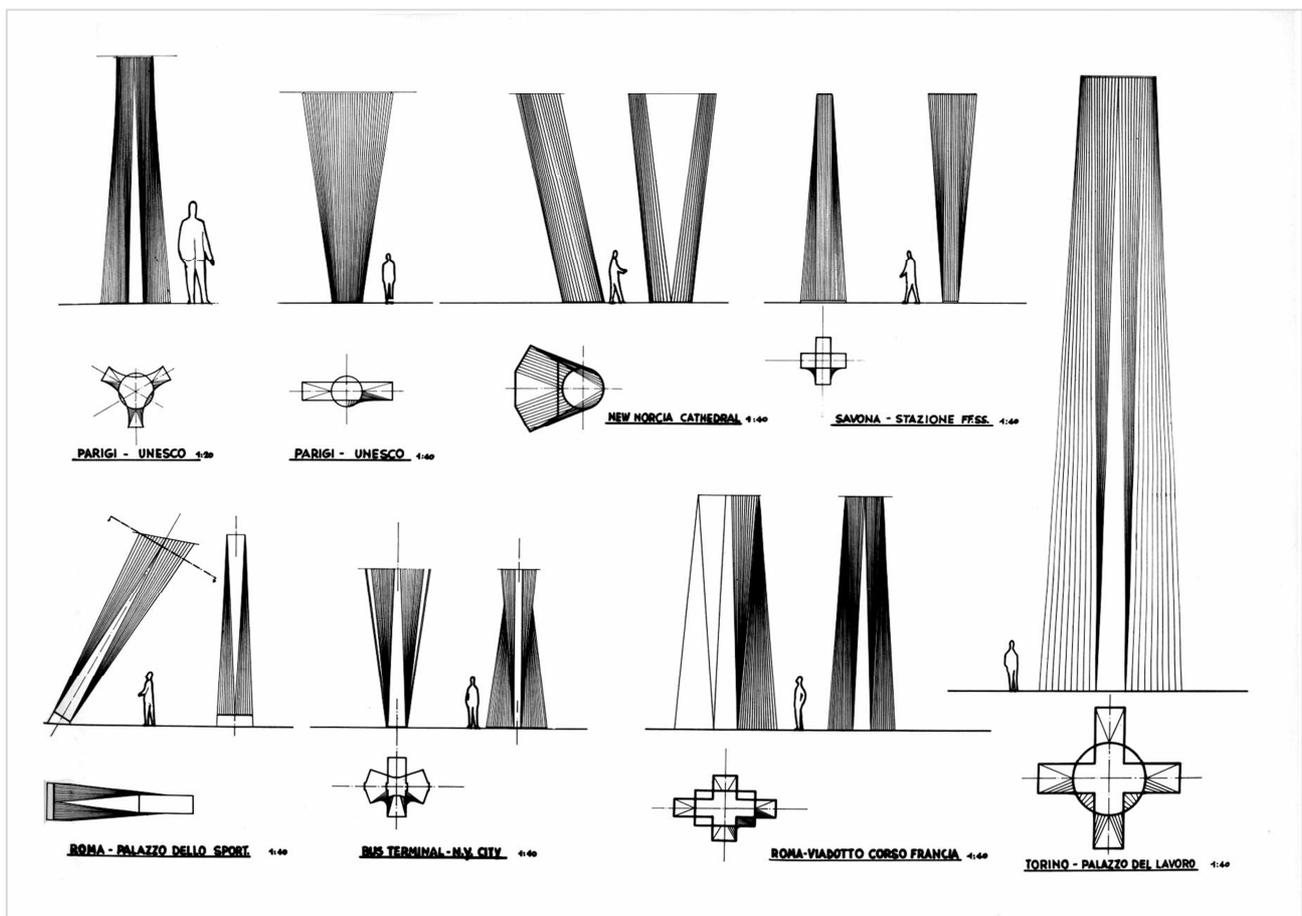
Comparative plans and elevations of transitional concrete piers in Nervi's work, 1953-1961. (from Nervi, *Aesthetics and Technology in Building*, 37.)
